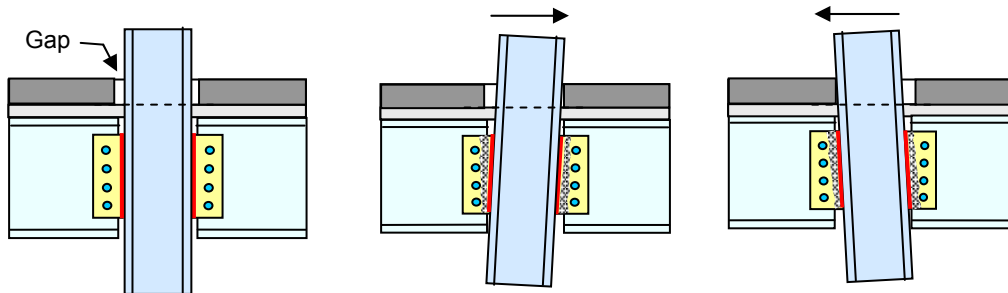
Gap around the Steel Column Prevents Damage to the Floor Slab
